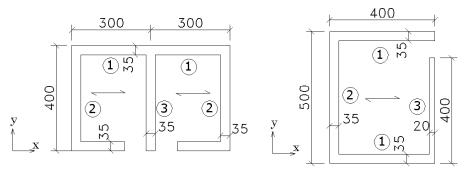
Wall numbering for building 1 (left) and building 2 (right)
